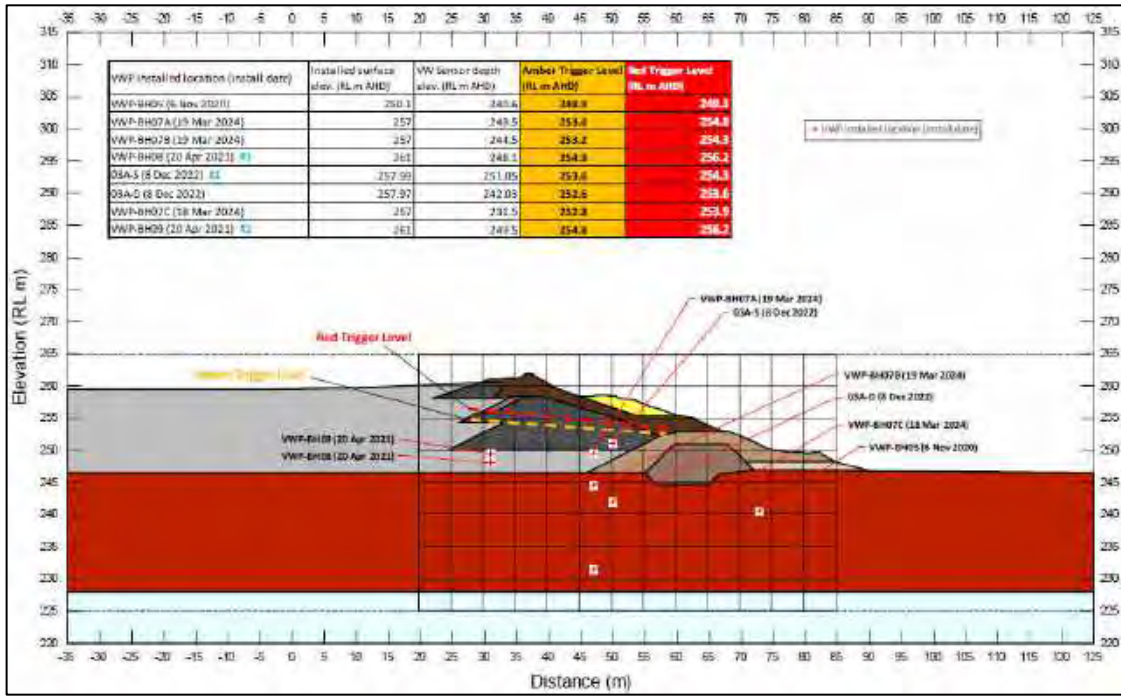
As-built FAD Cell 1 south-east wall embankment cross-section A - VWP trigger level profile
